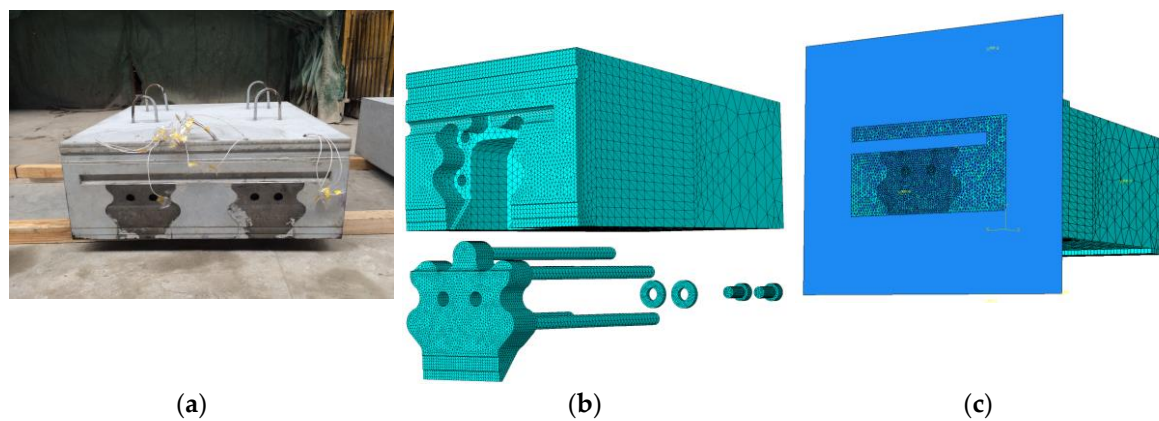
Tested joint segment and joint 3D model: (a) tested joint segment; (b) half of the concrete segment, embedded part, bolts and bolting pads; (c) model after assembly.
